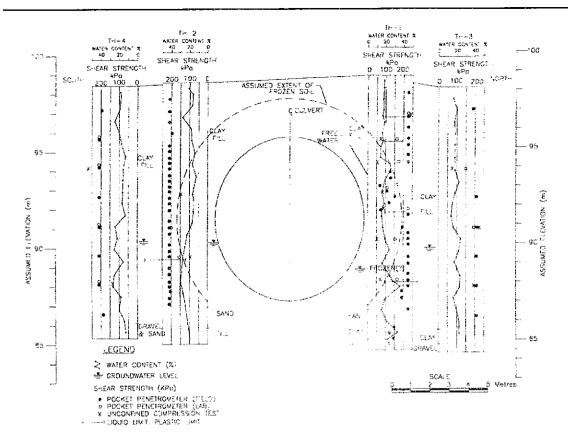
Bald Mountain Creek culvert -Soil stratigraphy, location of culvert and test results.
